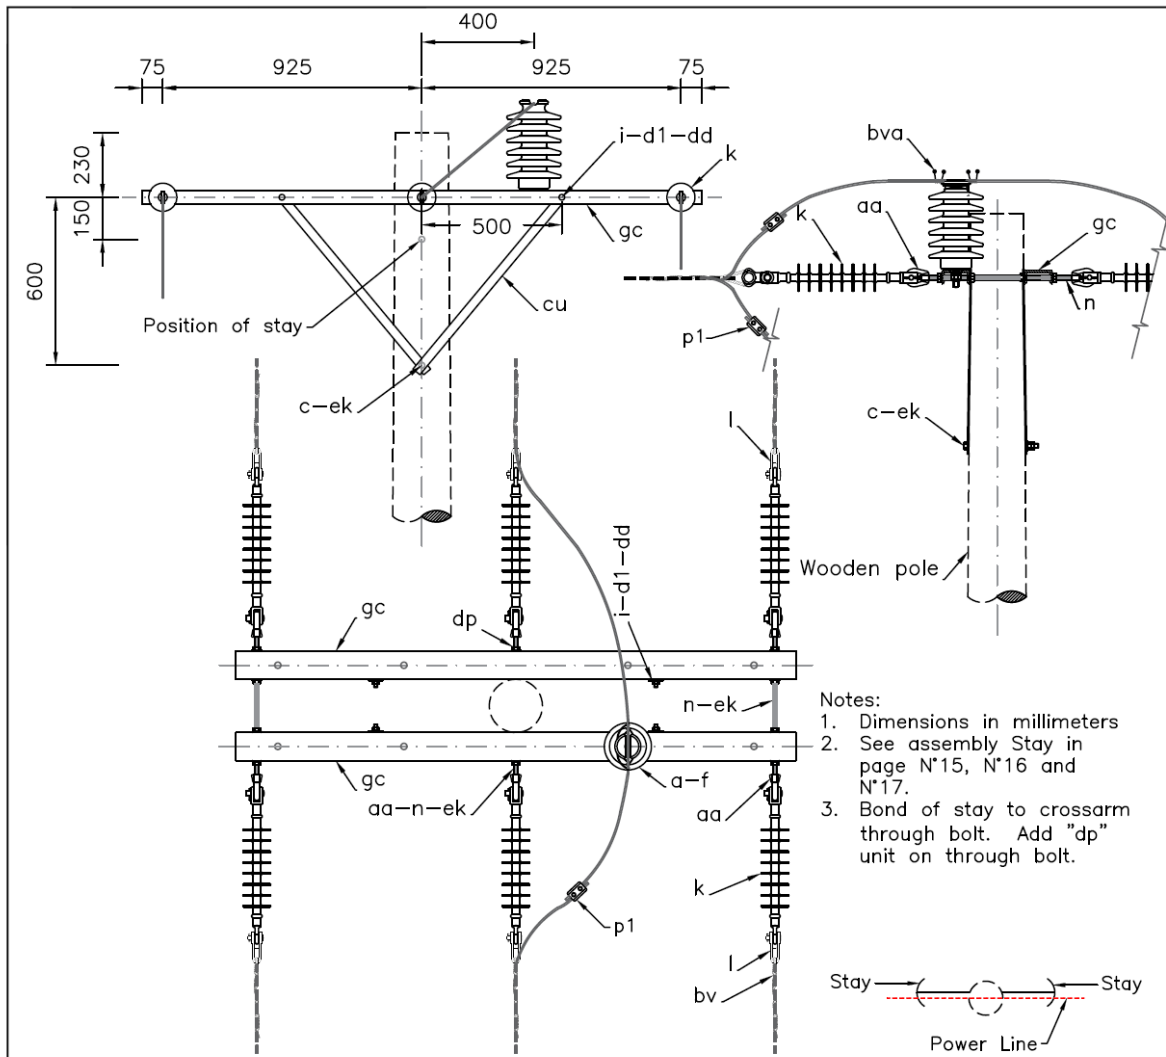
ZC7-1\_Deadend (Single)\_ 30 kV Dead End Terminal Assembly- Pole
